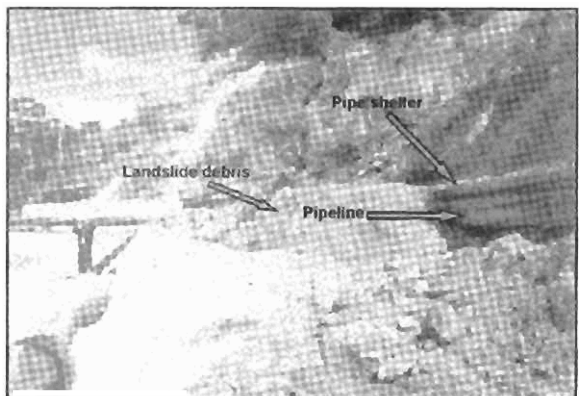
Taken along the Mahanagdong to MG-RD1B access road. Shown is a landslide which covered the pipeshelter and pipeline. The pipe shelter protected the pipe from damage.
